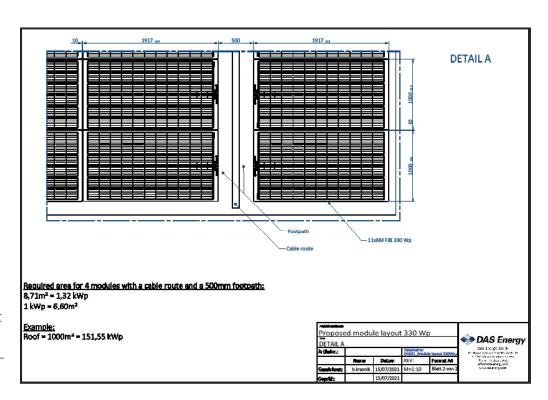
Exemplary module layout for flat roofs (module type 11x6M FJB) – detailed view
